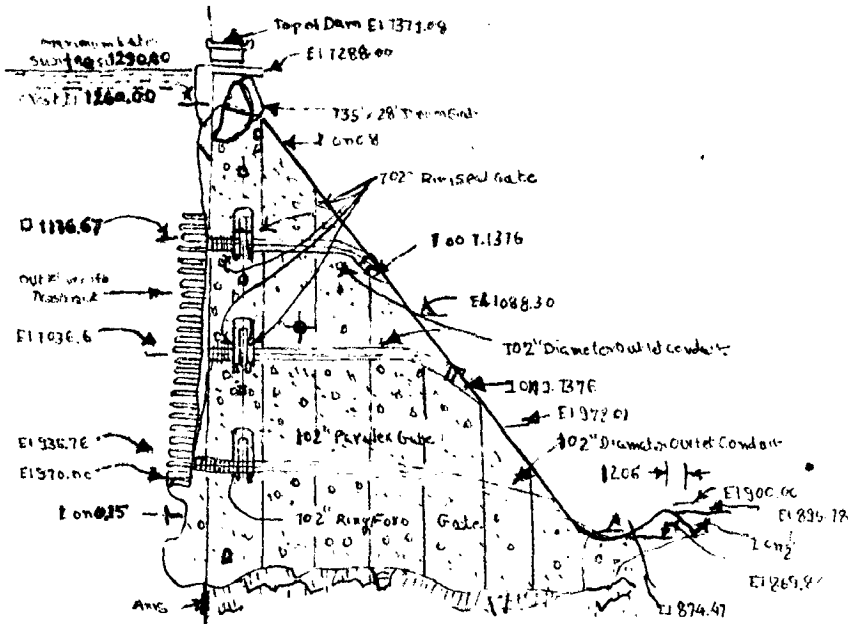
FIG. A SPILLWAY SECTION GRAND COULEE DAM
